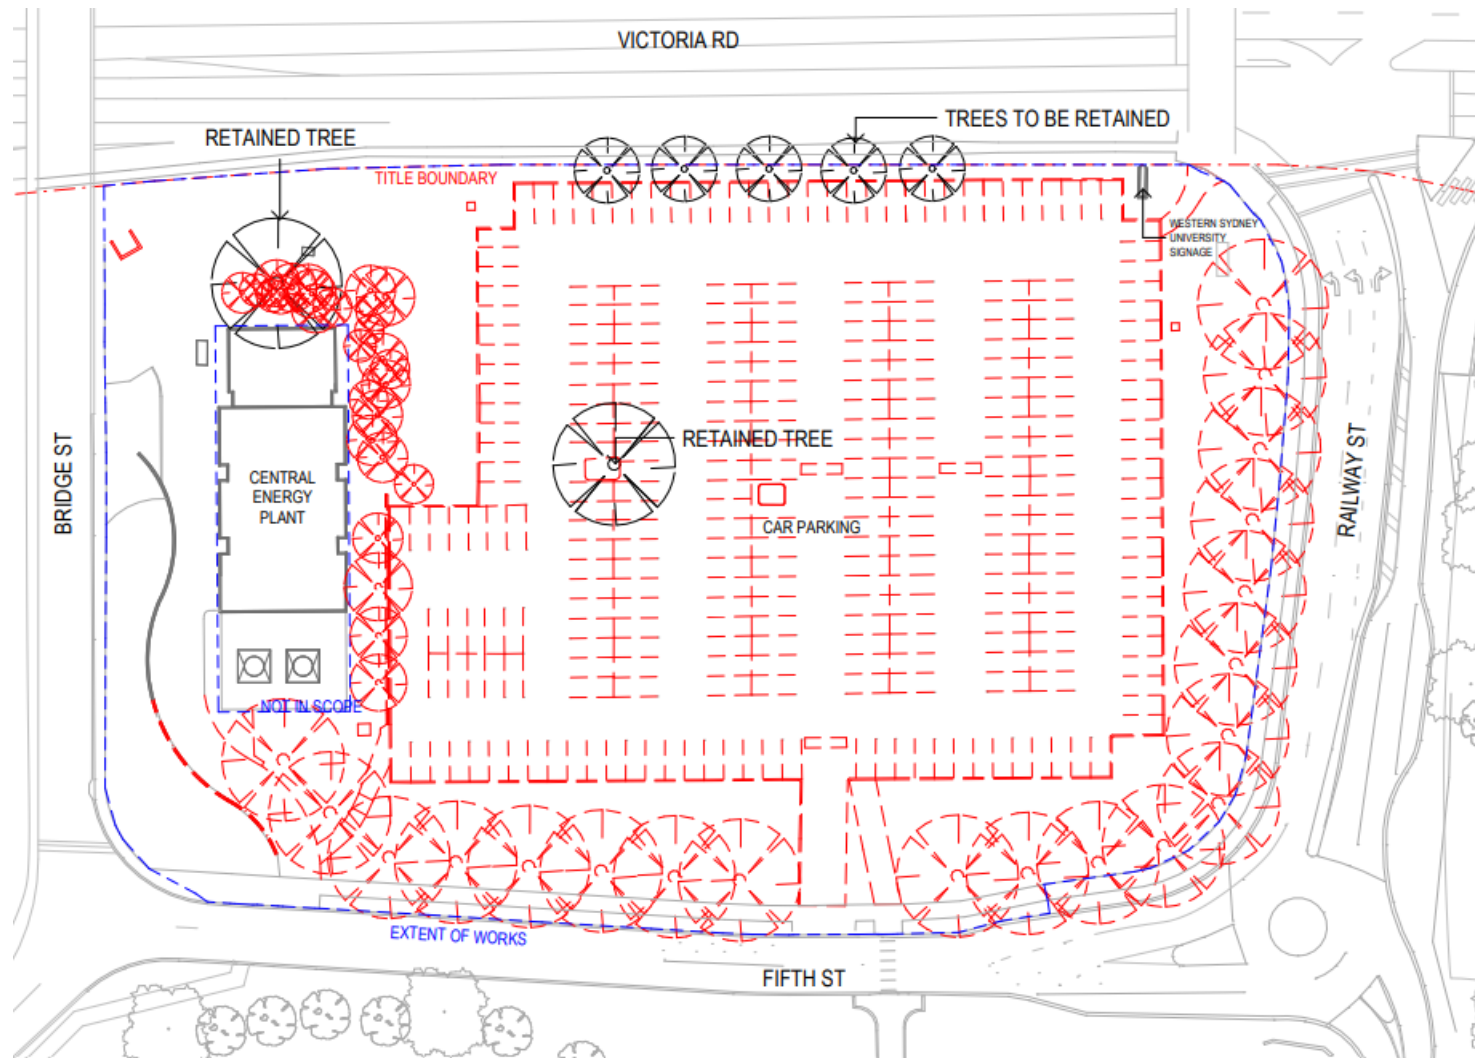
Demolition Plan. Source: Jackson Clements Burrows Architecture 2024
